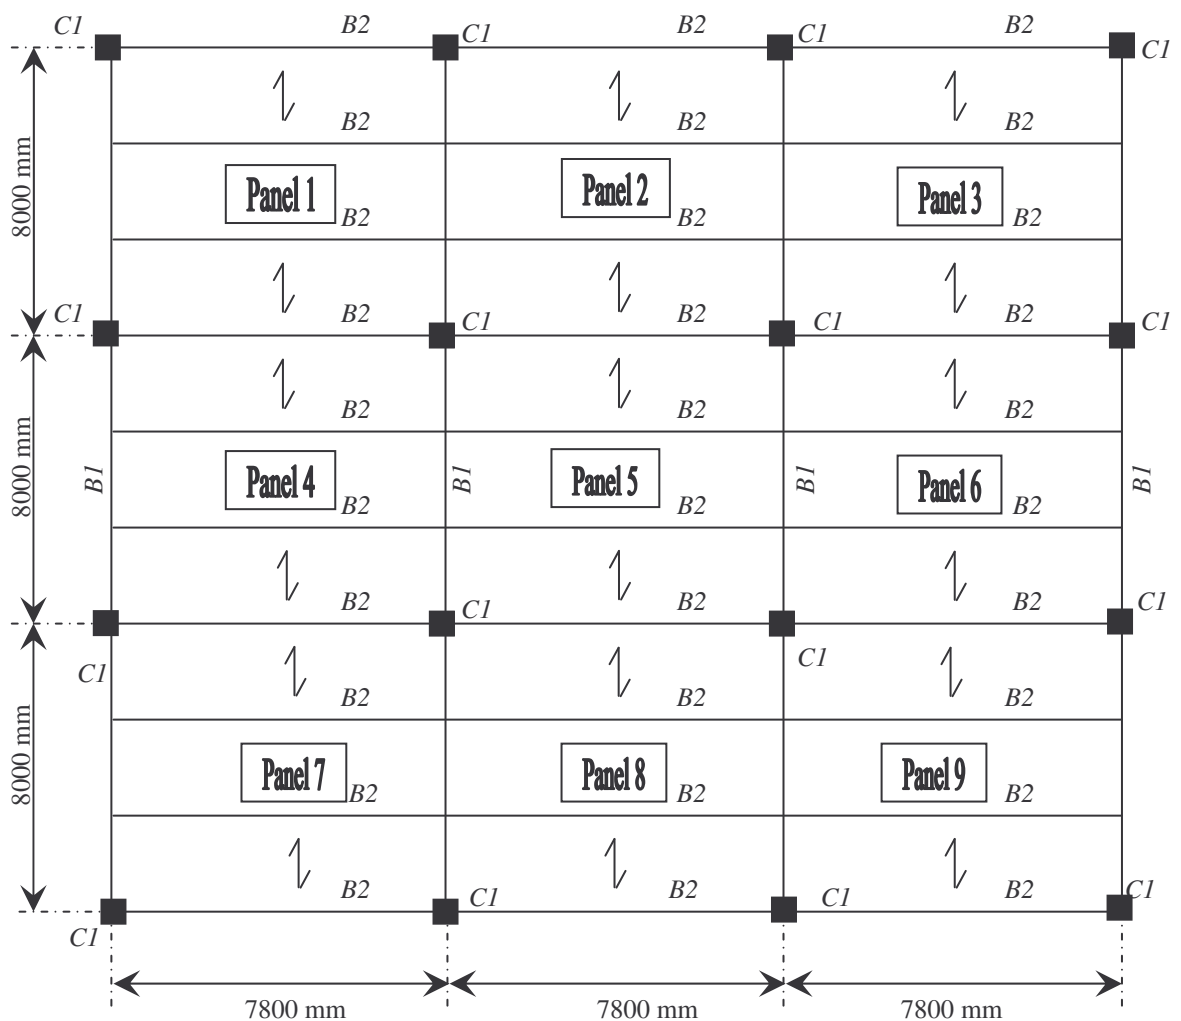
Structural configuration of the 3 x 3 steel-deck composite floor model
